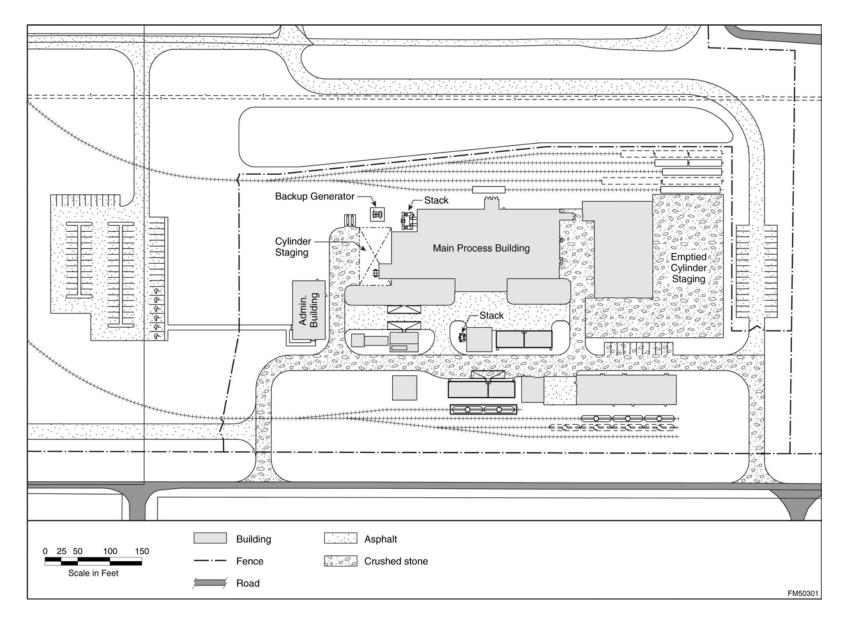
Conceptual Conversion Facility Site Layout for Portsmouth
